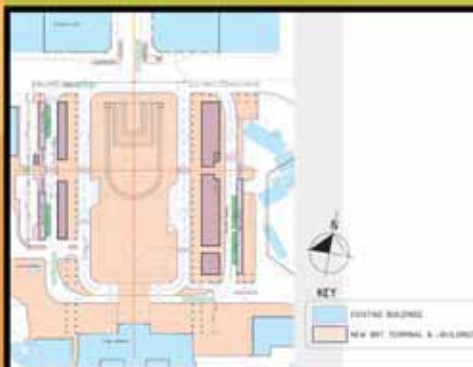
PRETORIA STATION PLAN. (Vorster 2009)
